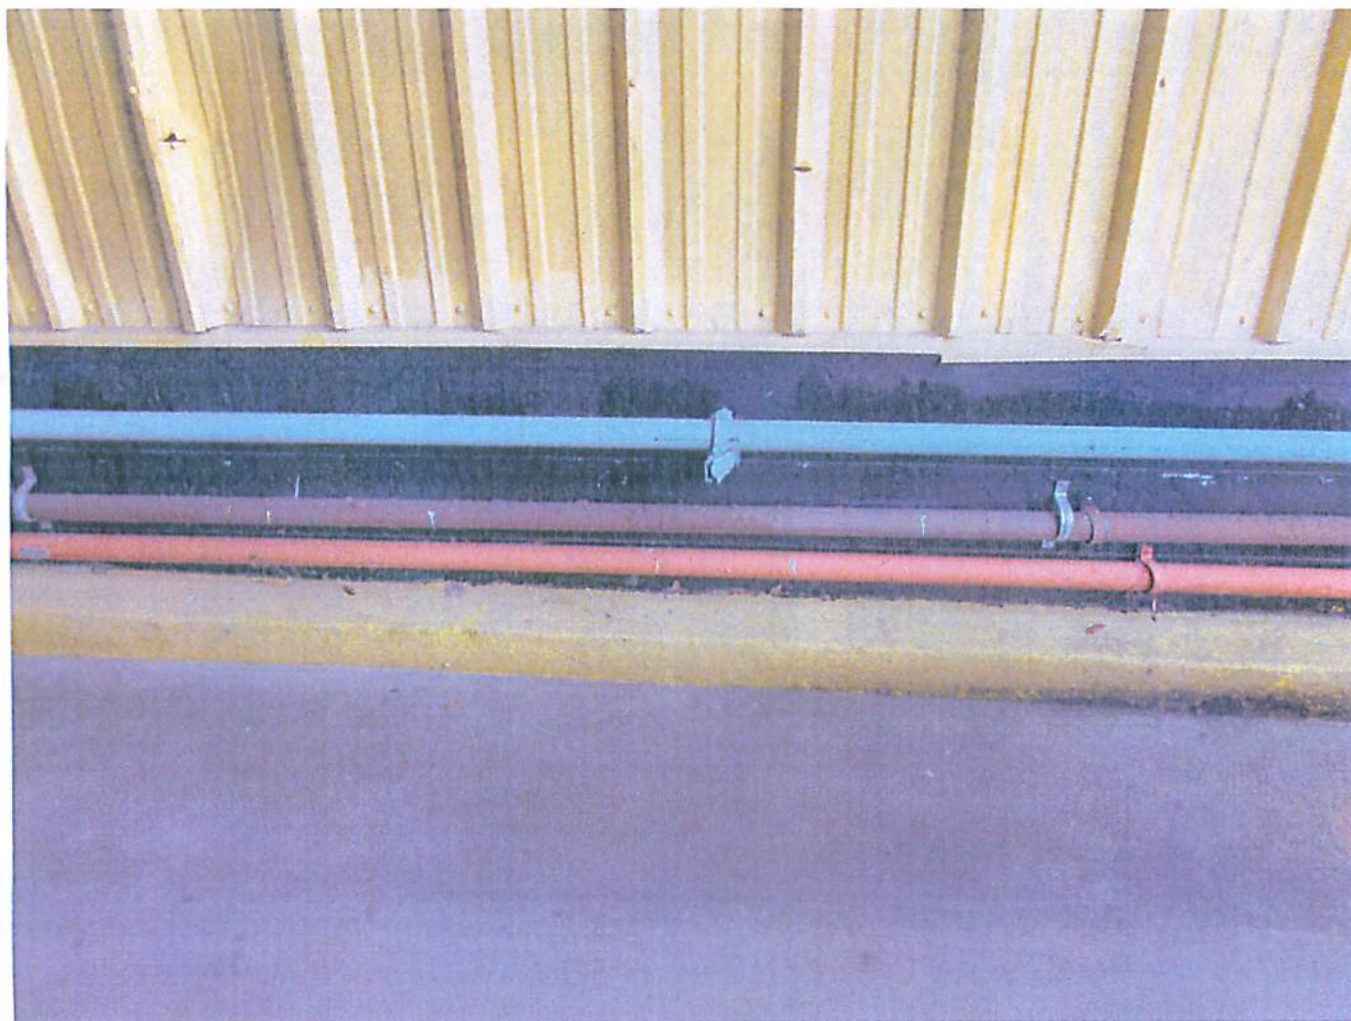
Hazardous waste transfer line from loading dock to storage tank
